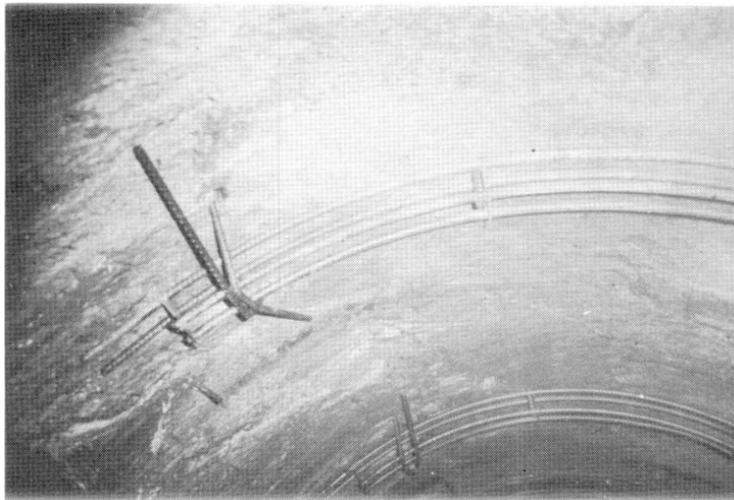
Tunnel wall with rebar steel basket for shotcreting of ribs
